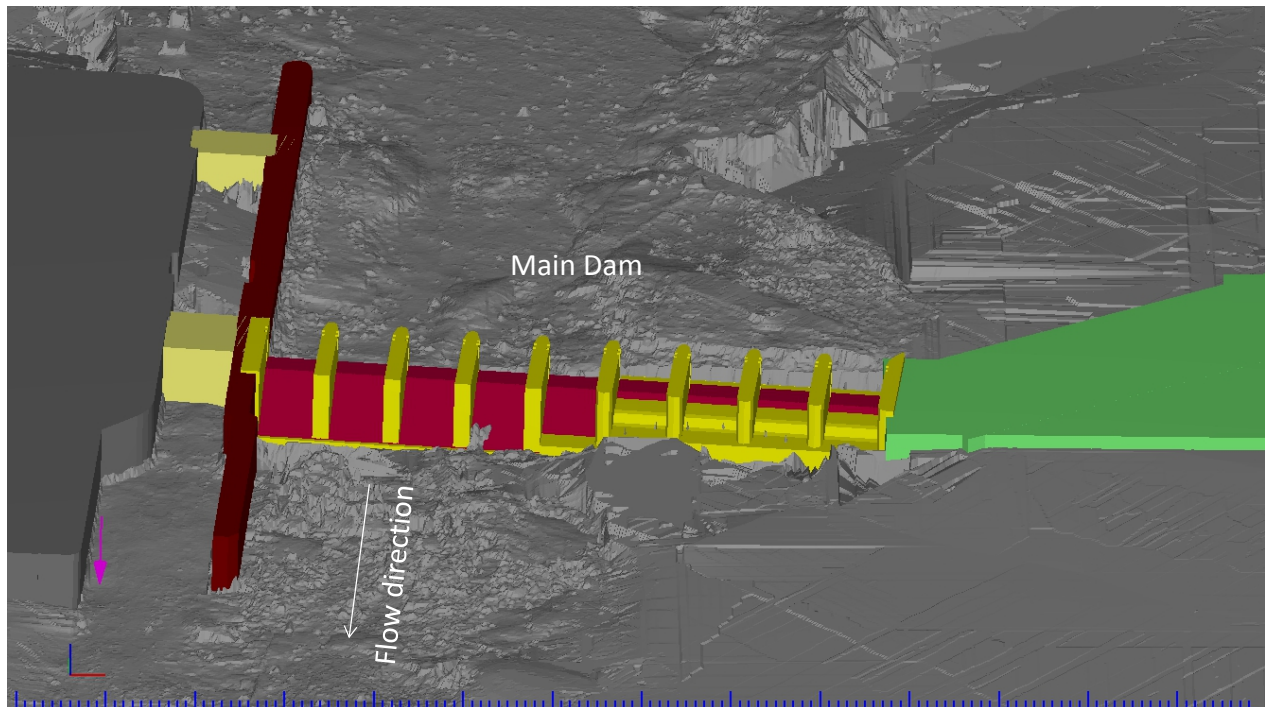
Zoomed 3D model geometry view of the Main Dam (rebuilt structure, new sill elevations)
